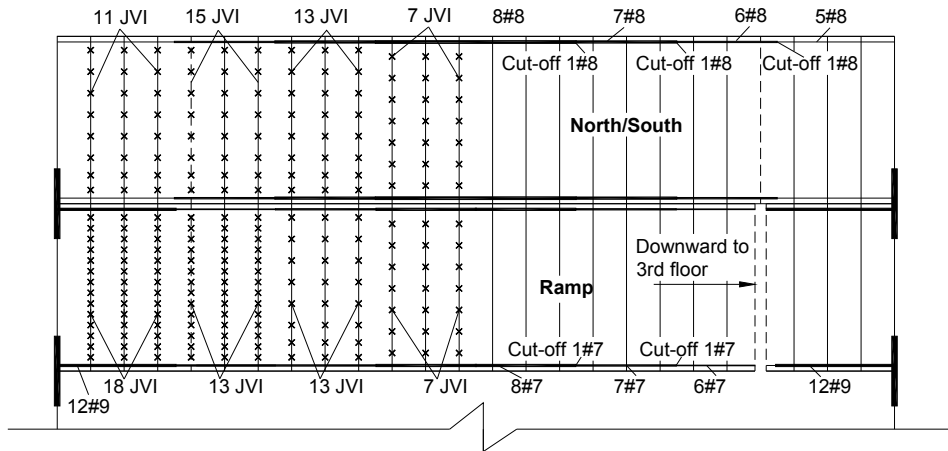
Diaphragm reinforcement at top floor for example 1B.
